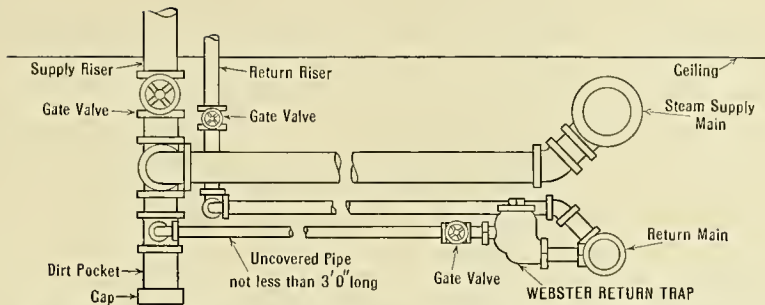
Drip of main and up-feed riser using horizontal cooling surface
